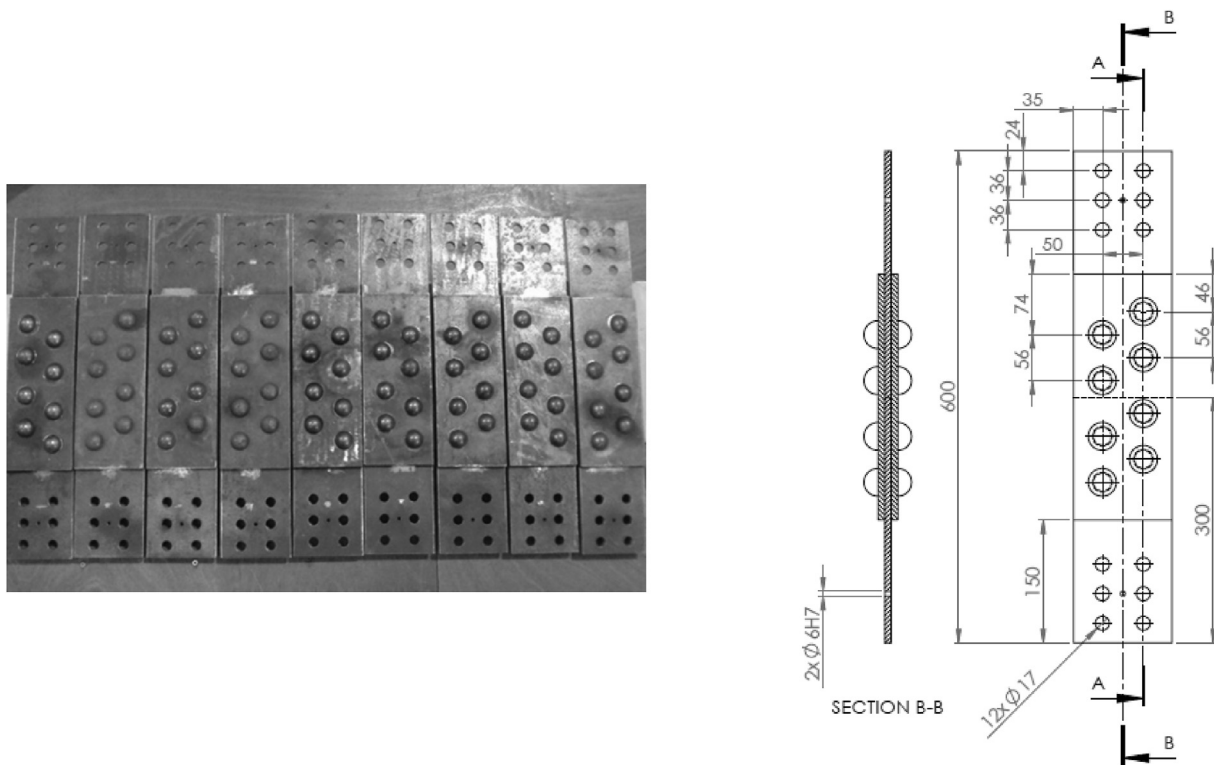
Double line double shear riveted (DLDSR) specimens [38].
